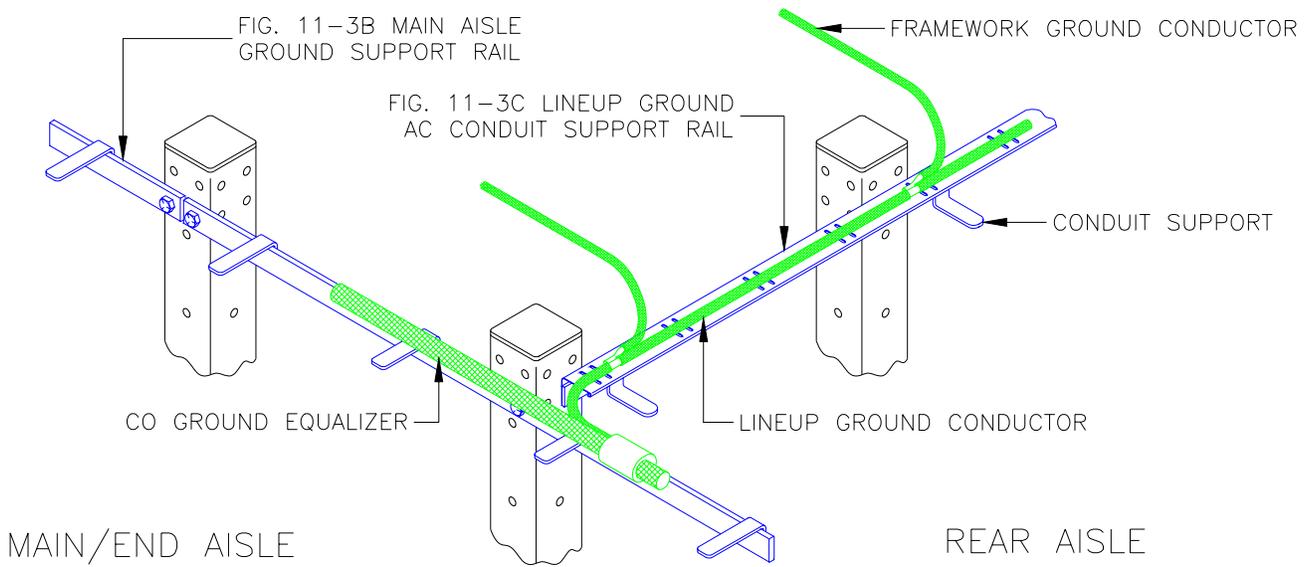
D – Typical Routing Of CO Ground Conductors
